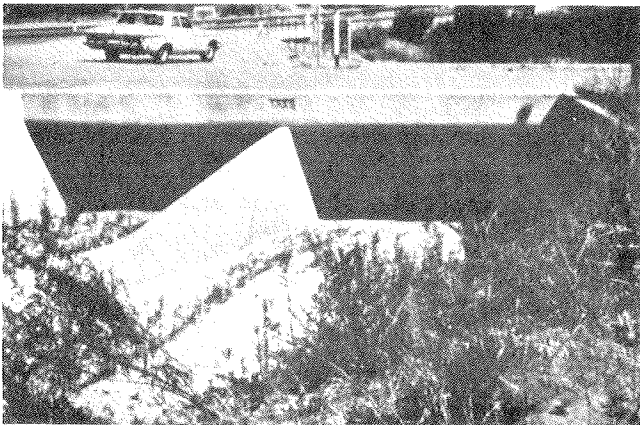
Concrete debris fin with sloping leading edge as extension of center wall.
